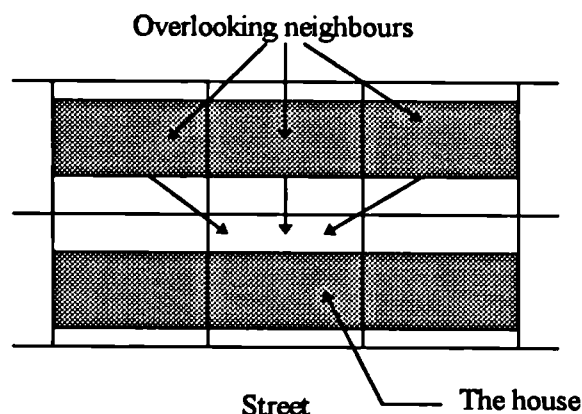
A plan for a group of houses in al-Erija showing the overlooking of the back neighbours onto the house backyard.
